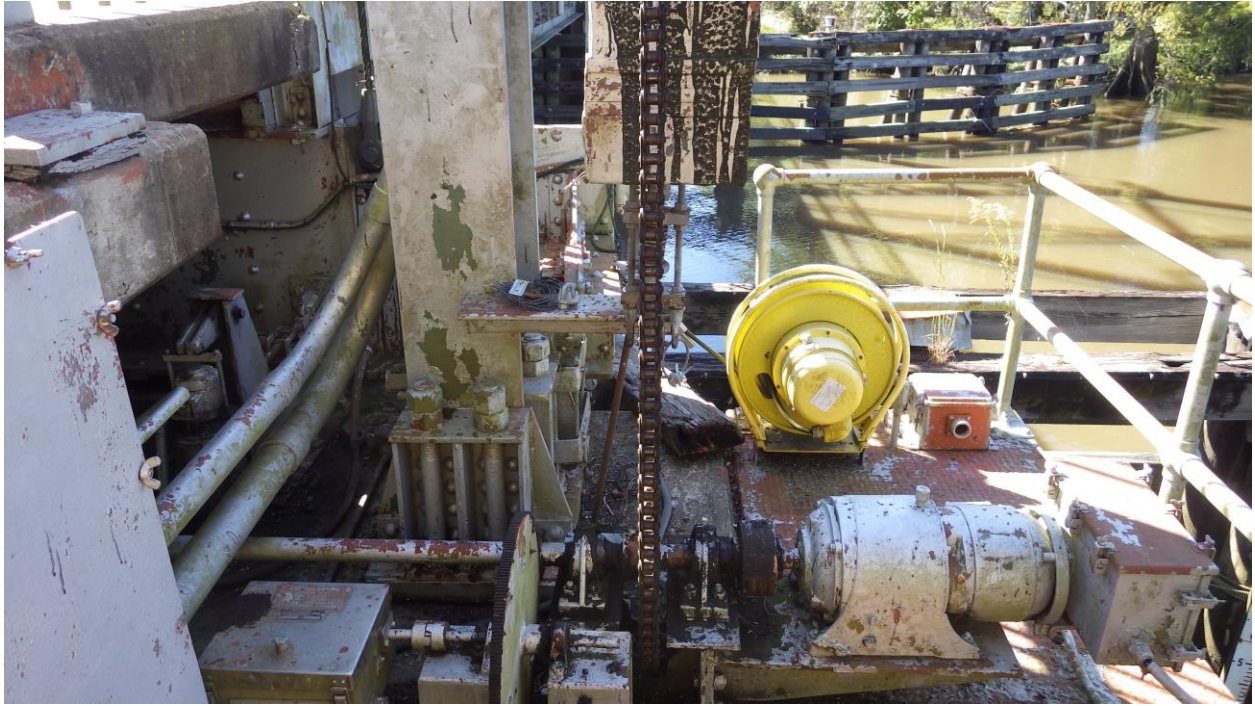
Tower Pier (barrier motor, tower leg base anchorage, lower tower leg, and general accessibility)
